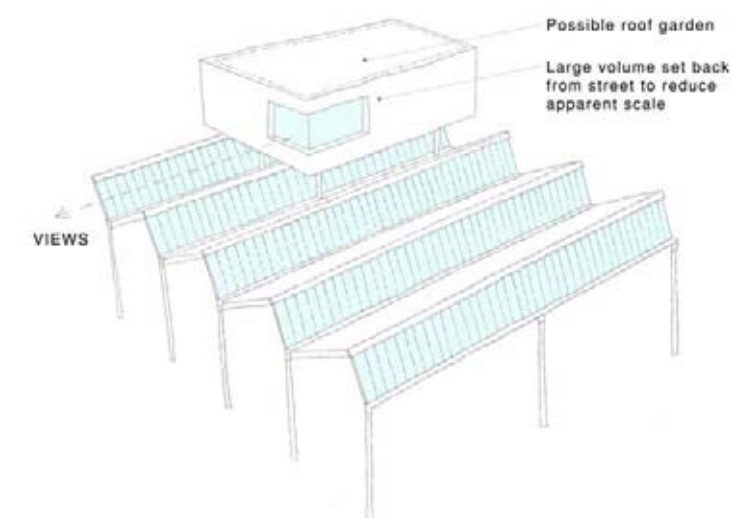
New build volumes on stilts. Minimal damage to existing fabric
